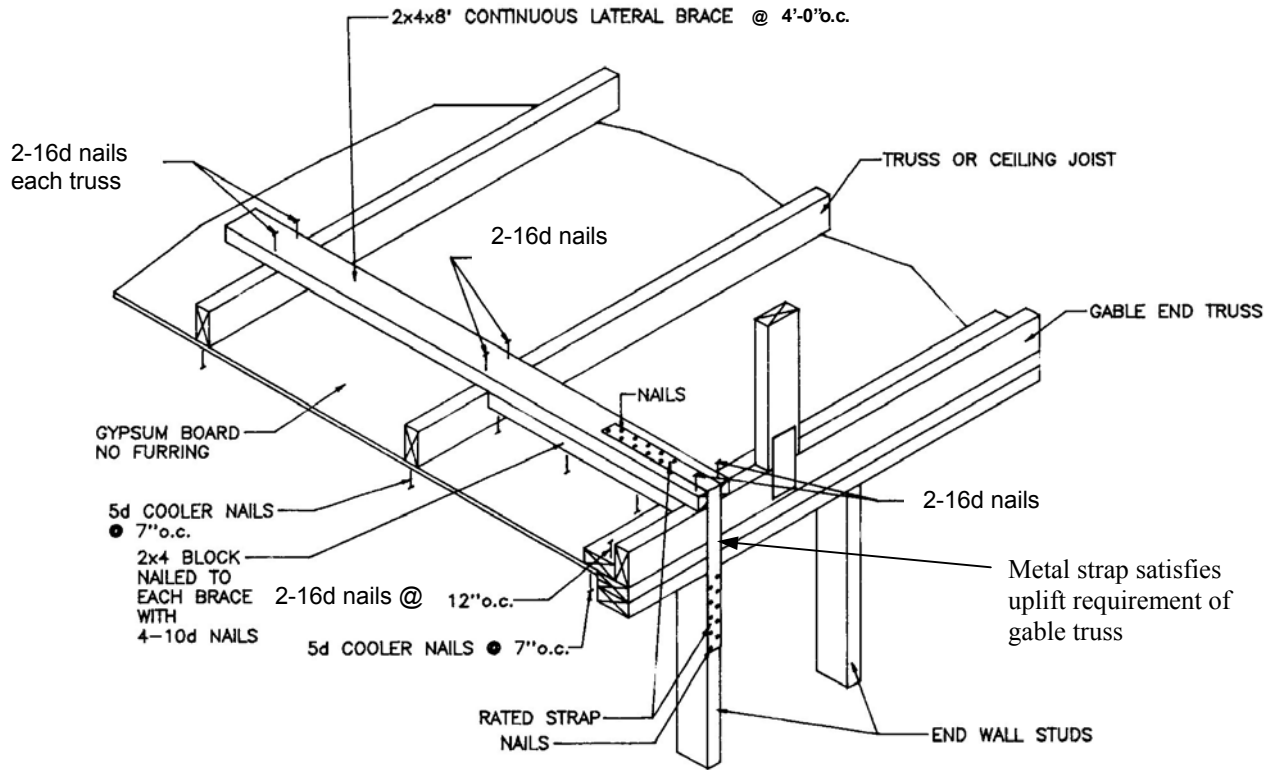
Horizontal Lateral Bracing Construction Details (adapted from SSTD10-99 from Southern Building Code Congress International, Inc., 900 Montclair Rd., Birmingham, AL, 35213-1204).
